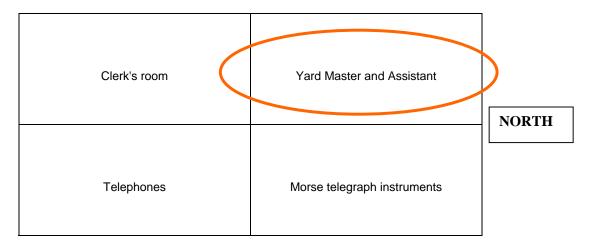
First Level. Yard Master's Office, Sydney Plan (drawn from June 1916 Plans, RIC Plan Room).
